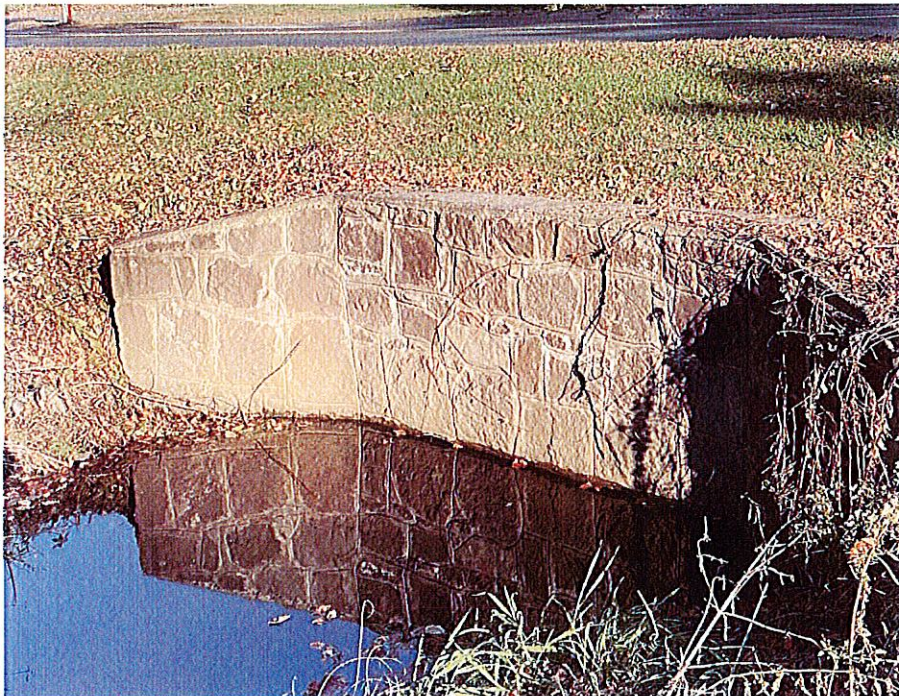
Newberry Brook culvert under Main St looking north, 11/8/2021. The two drainage pipes are completely beneath the water level on the downstream side.
